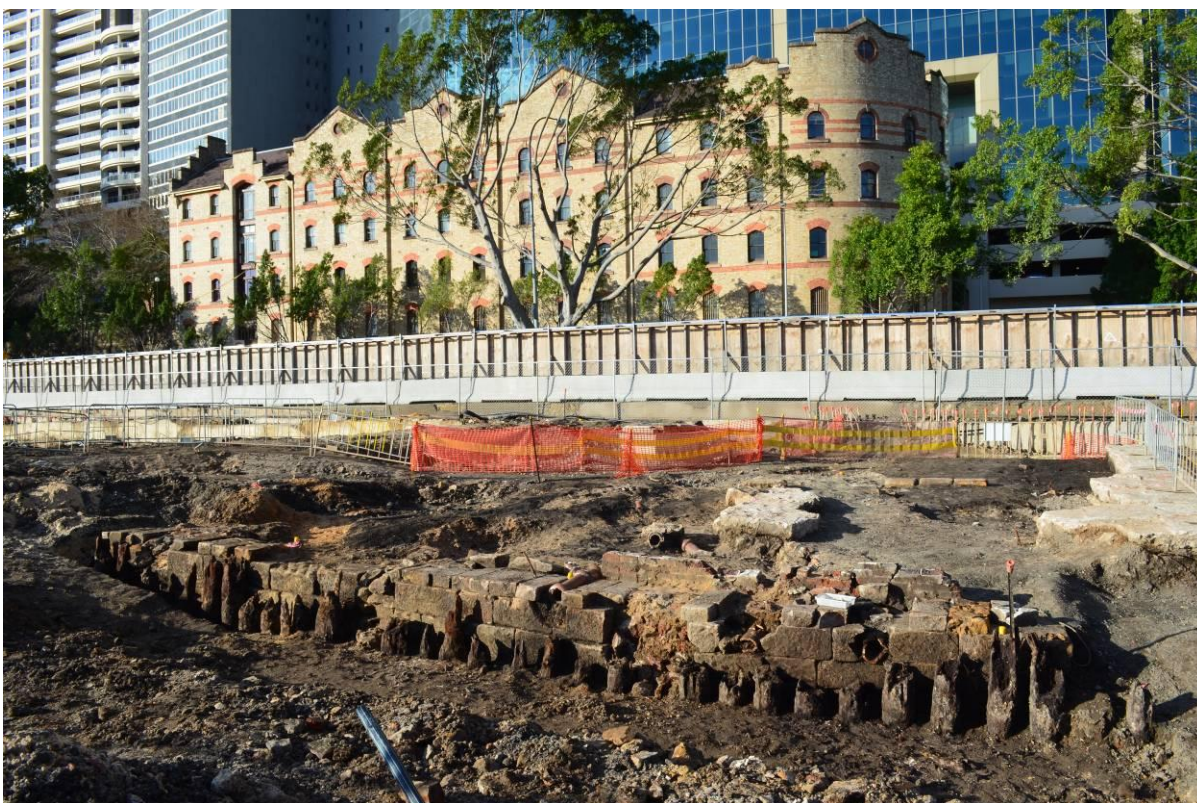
Top of the latest phase of sandstone seawall with the service pipes cutting through. On the right are the concrete footings for the Flemish-style building. In the background is the rebuilt bond building on Hickson Road. Photo taken looking northeast.
